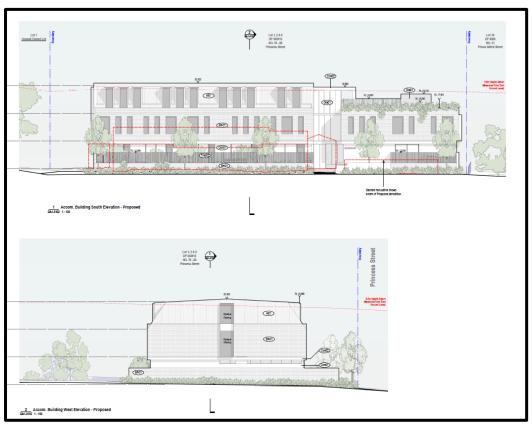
Motel Accommodation Elevation (South and West) (Source: H&E Architects.
